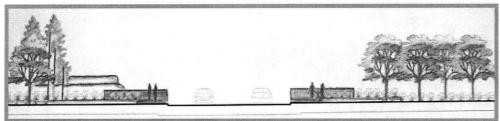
Portion of section/elevation E-E1 showing station platforms at CP Rail Line Crossing
